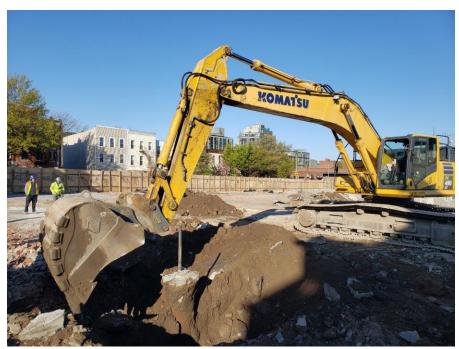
Kingdom excavating an area to install a foundation pile cap in the eastern part of the site (facing southwest)
